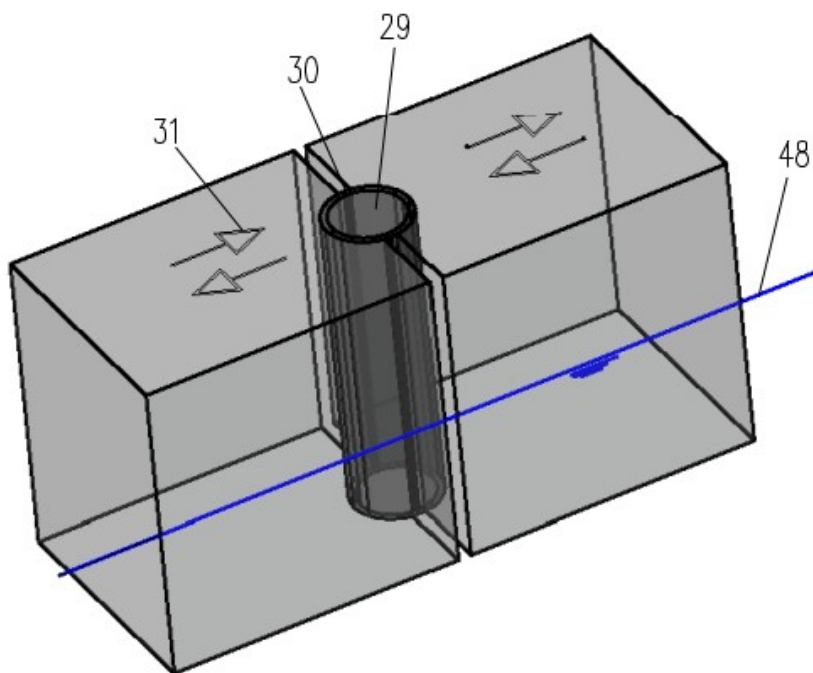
Variant "Combination of clamping construction with the steel cable reinforced clamping waterstop and overdrilling of the joint"
